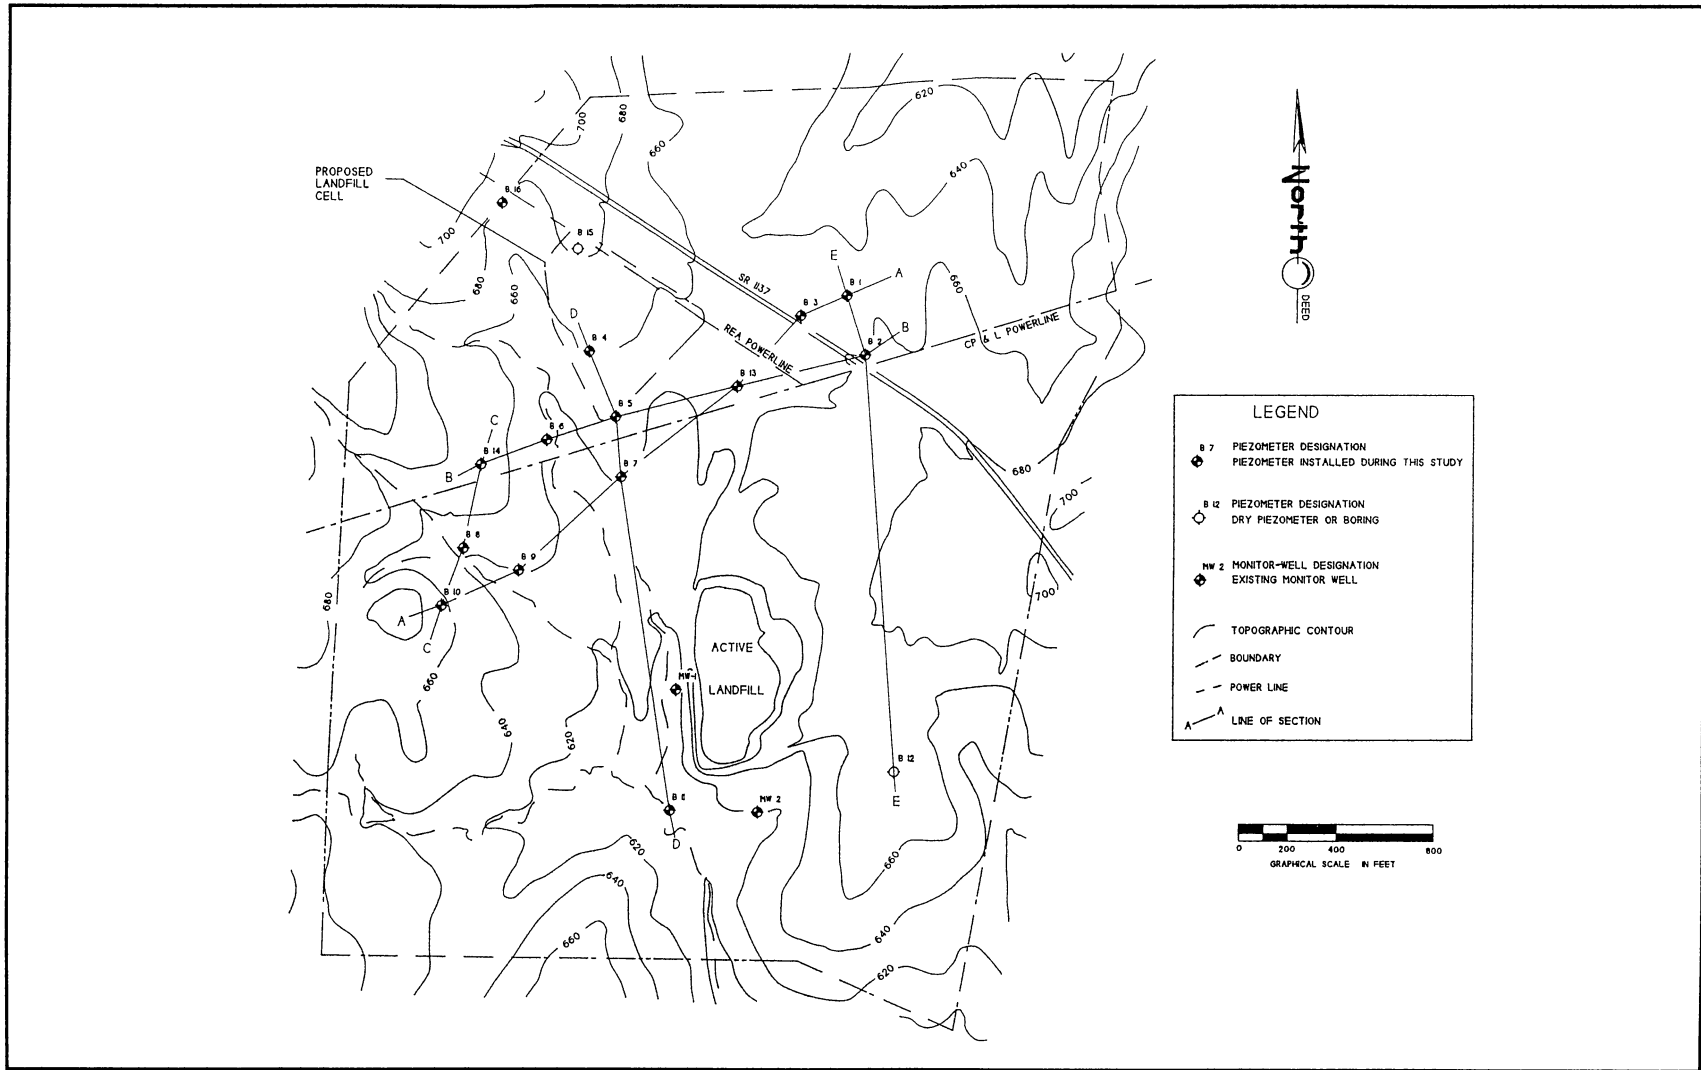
Site plan. Lines of cross-section are shown as Figures 8-12.
